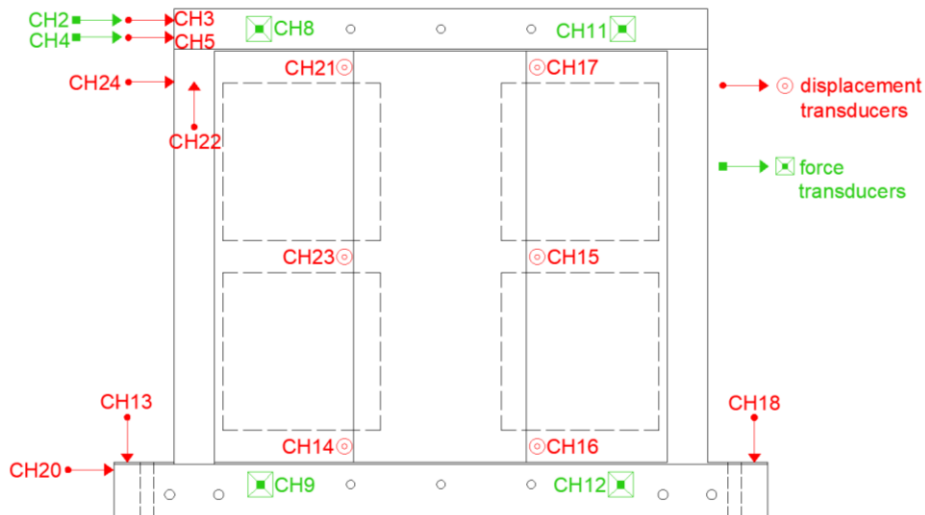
Position of measurement points and air bags on infilled frame with door opening
